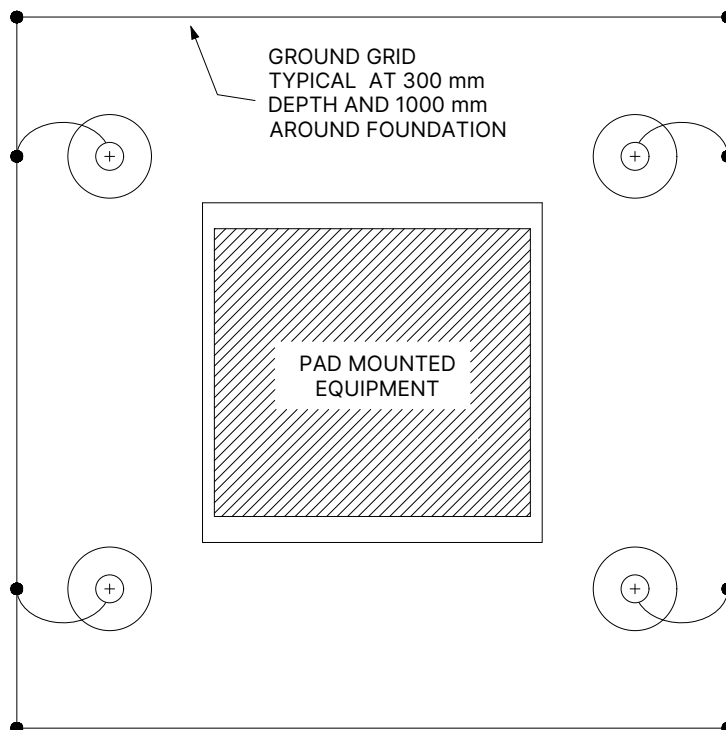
DETAIL FOR BOLLARD GUARD POST INSTALLATION AND GROUNDING
